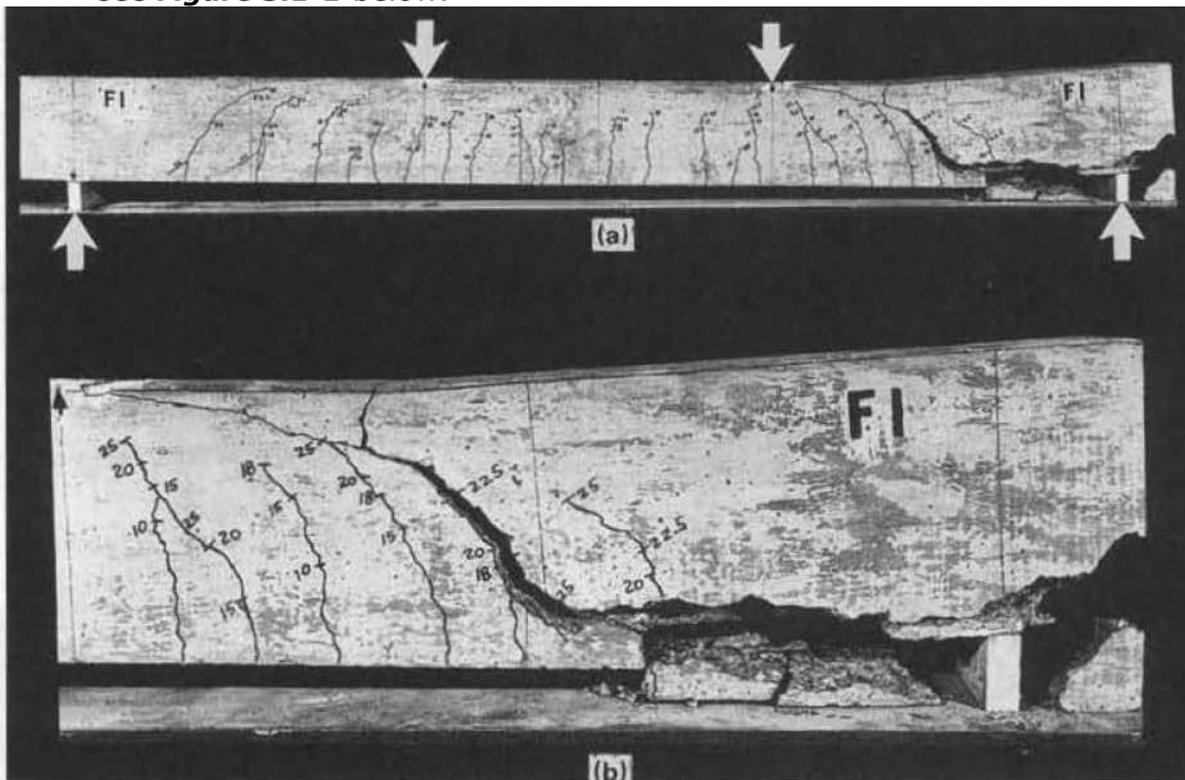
Shear failure of reinforced concrete beam: (a) overall view, (b) detail near right support.
